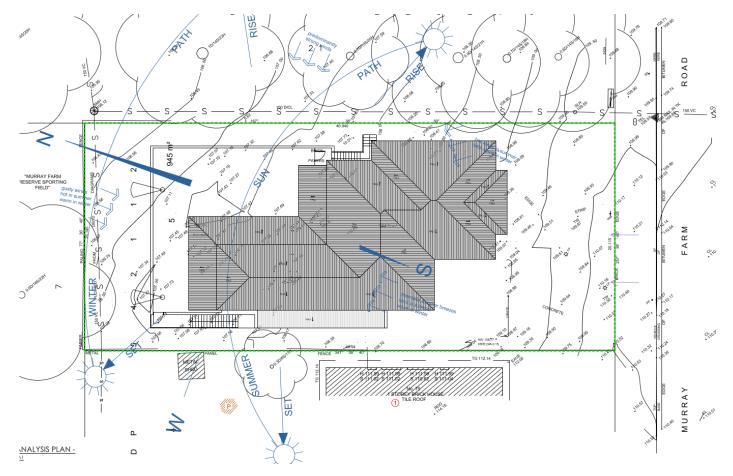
Site Plan. Source: Submitted Architectural plans prepared by Janssen Designs.
